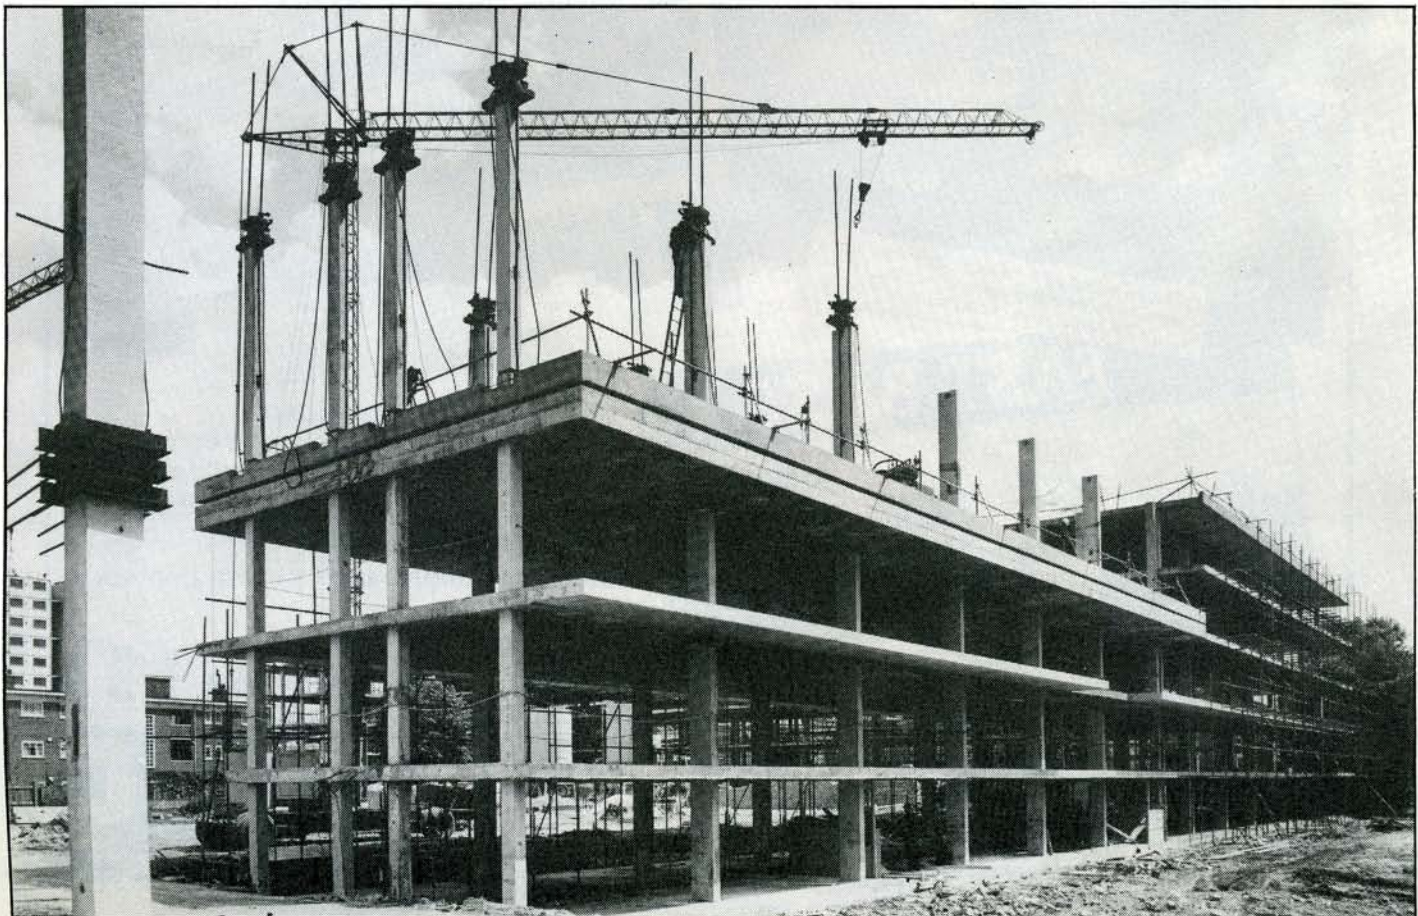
Lift slab floor construction using lightweight concrete at the Holly Street Housing Development, Hackney, London. Designed by Evans and Langford
